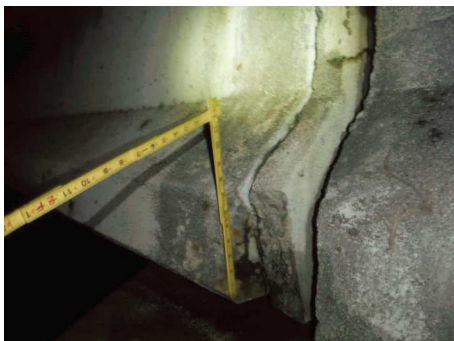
Caption: Patch Spalls in Beams [approx 14LF]
